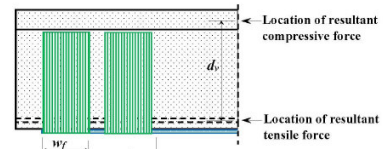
U-wrap anchors to prevent end debonding
